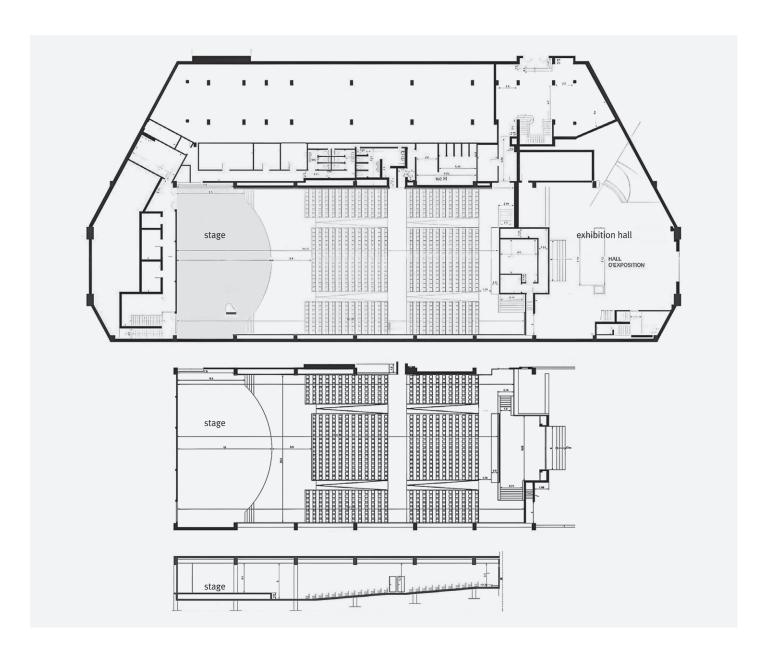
Floor plans and longitudinal section of El Khalifa Cultural Center
